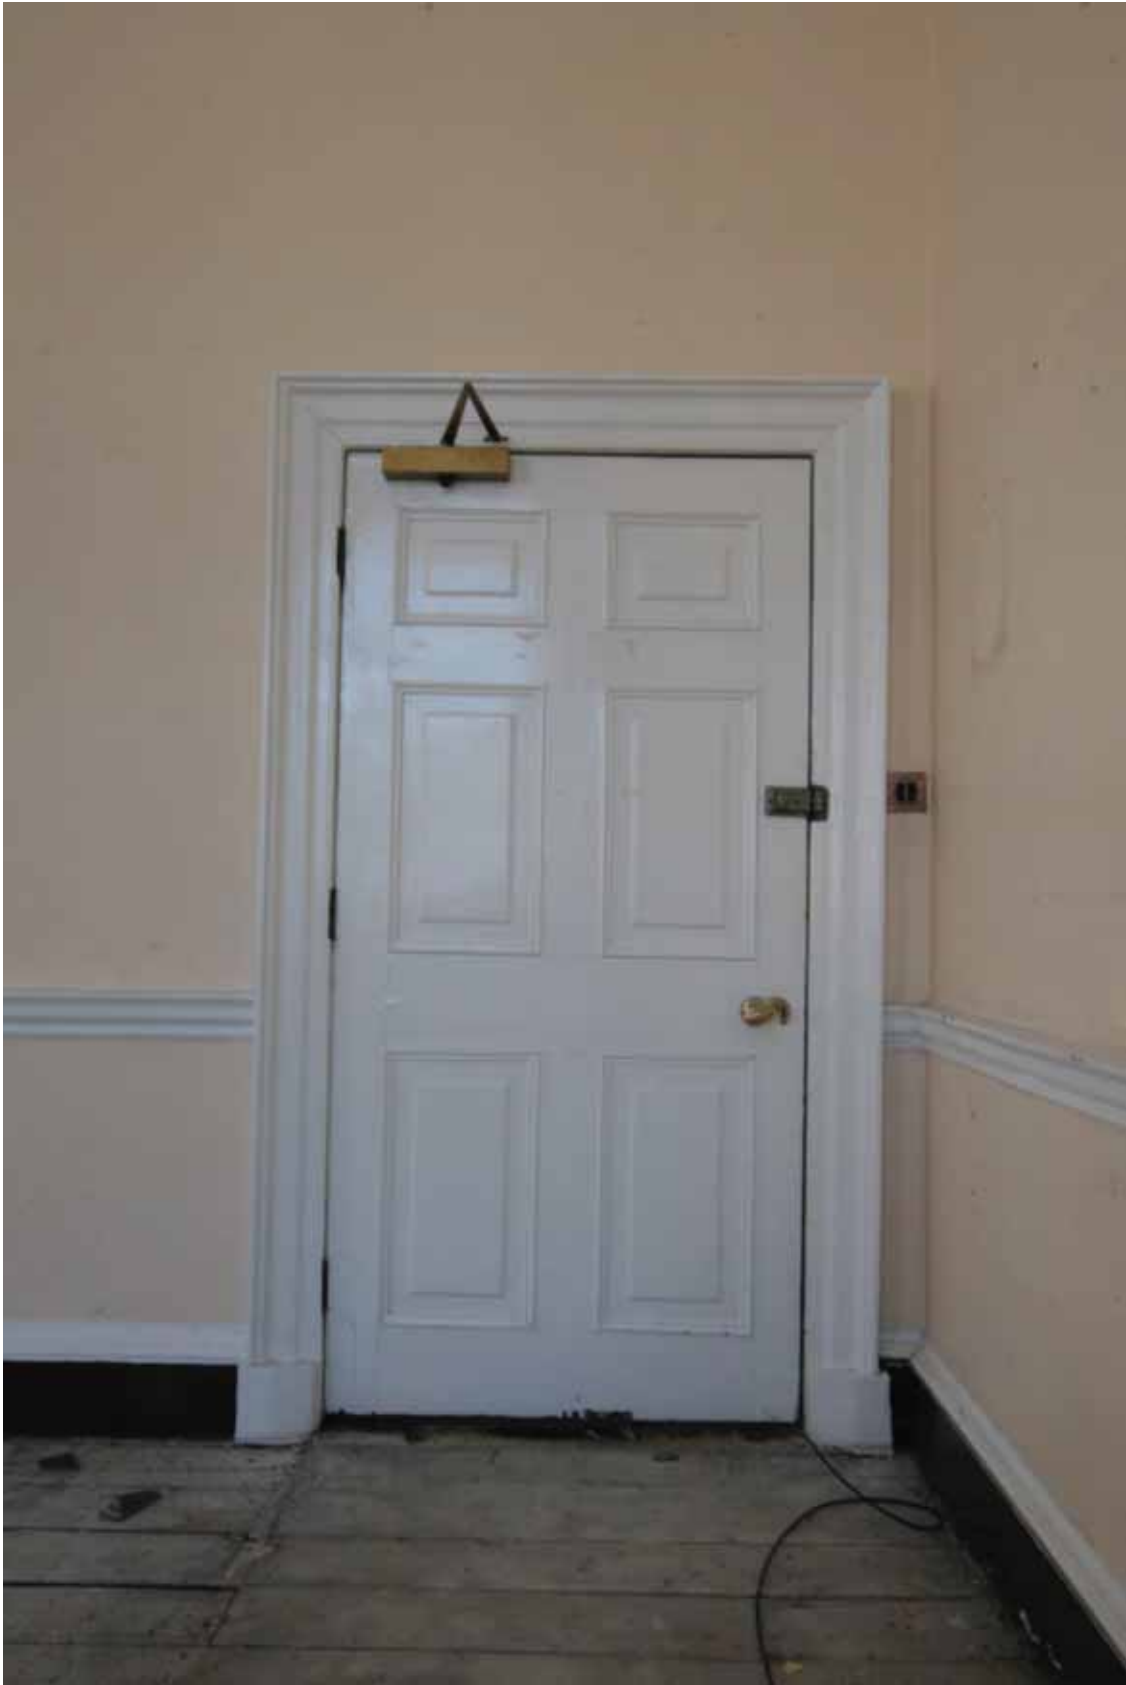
Doorway at the south end of the east wall in Room F09, looking east (EAF10 148)
